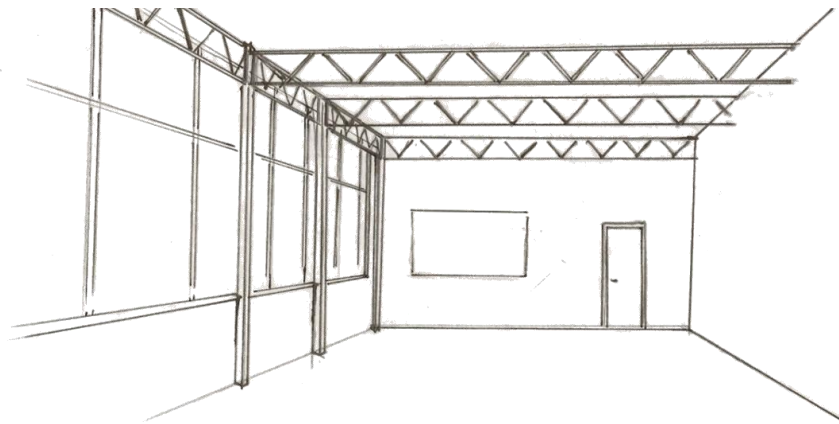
The light-steel frame which was one of the main characteristics of the new school type.
